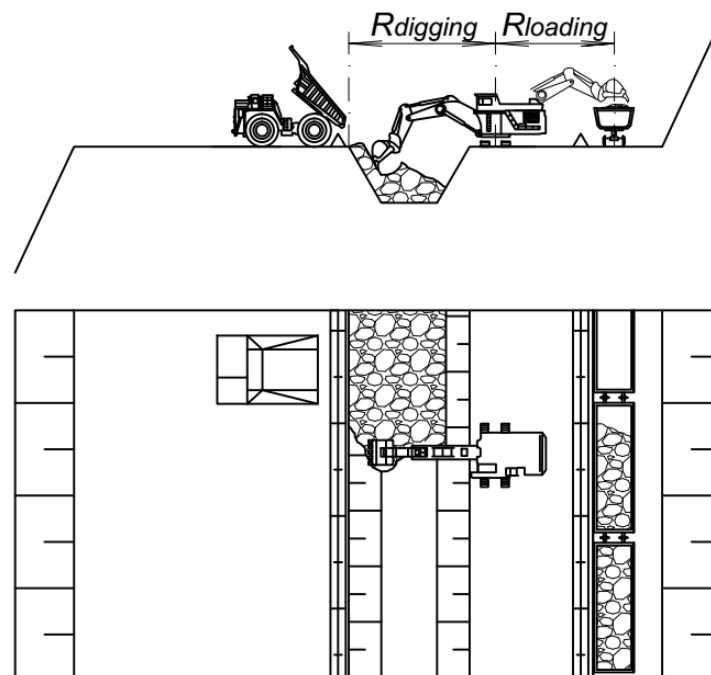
The technological scheme of operating a hydraulic backhoe on a reloading platform
